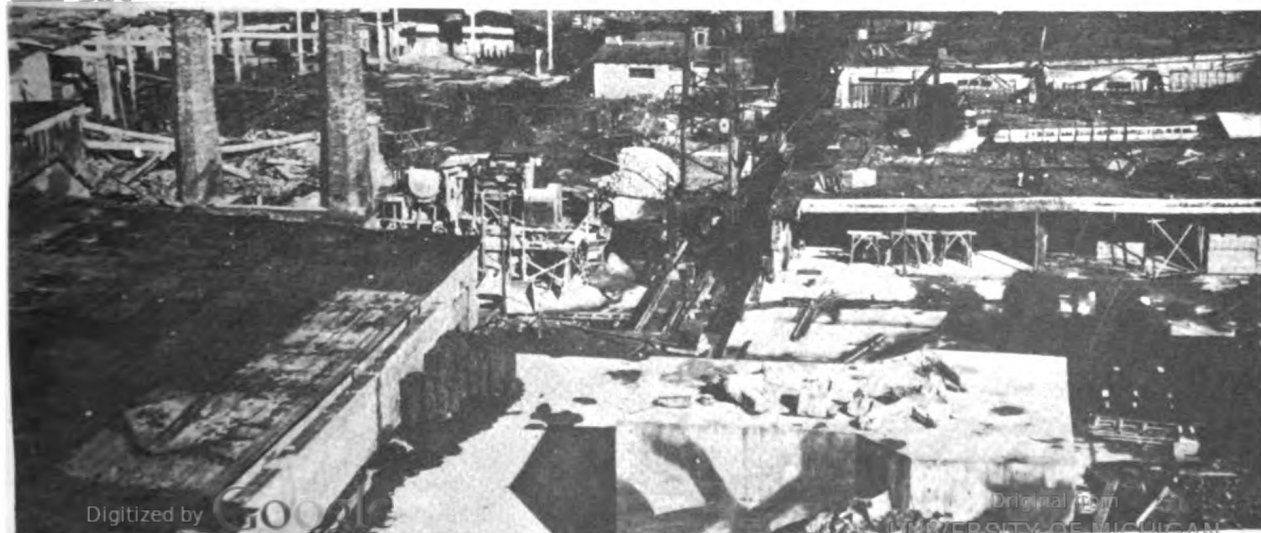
View looking northeast - showing portions of Bldg. R still standing. Bldg.
